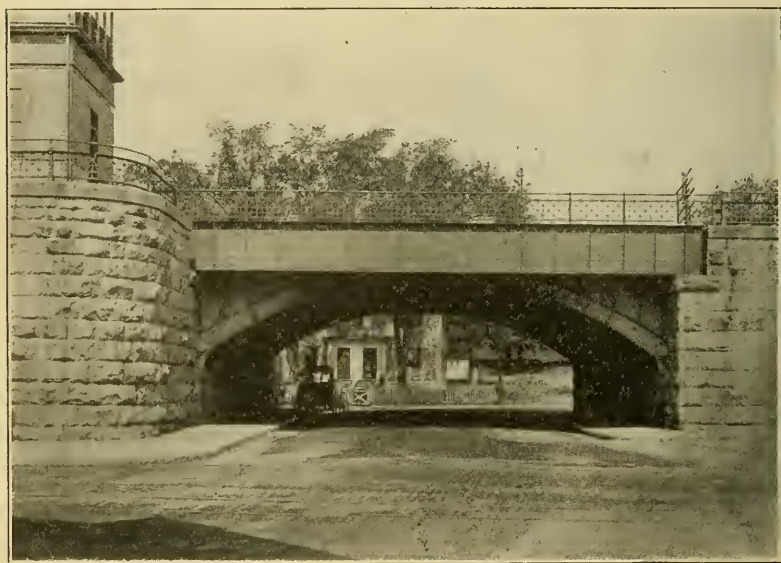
WALK HILL STREET STEEL ARCH, FOREST HILLS.
